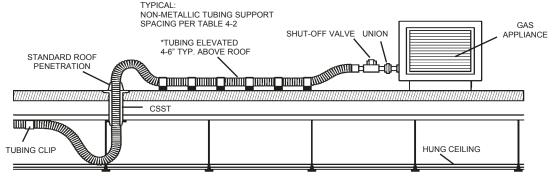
HEIGHT OF ELEVATION BASED ON LOCAL PLUMBING/BUILDING CODE REQUIREMENTS AND/OR WINTER ICE BUILDUP.
